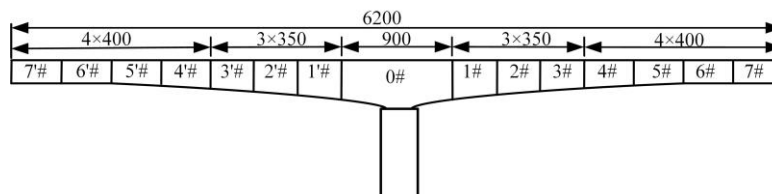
Cantilever construction beam segment division diagram (cm)
